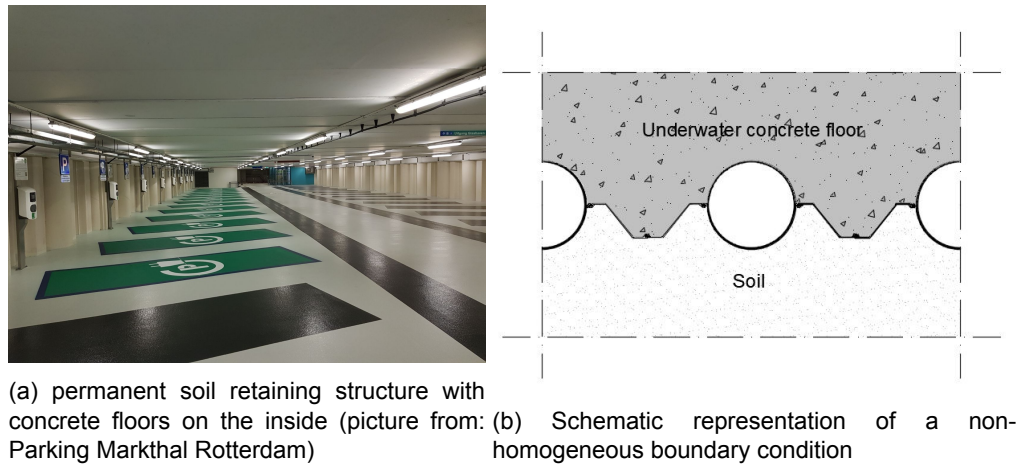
Example of a Underwater concrete floor (UCF) boundary conditions
